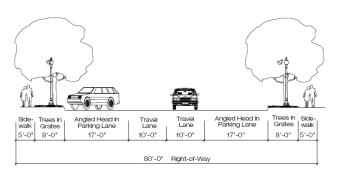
Porter County TND Street Section Classification "B-B": at Commercial Area featuring travel lanes, angled head-in parking, trees in grates and sidewalk.
